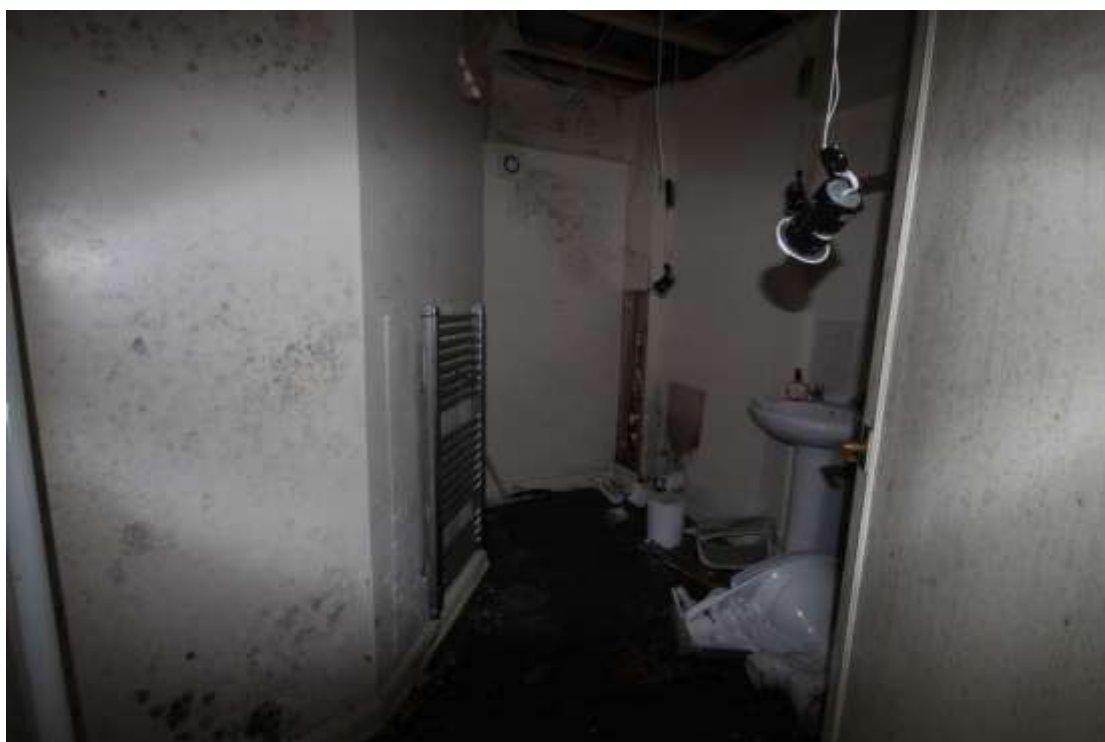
View of the bathroom on the ground floor of the Coachman's Halt, facing south west. This area has a modern dividing wall (picture left), separating this modern bathroom and allowing access from the front room to the southern extension.
